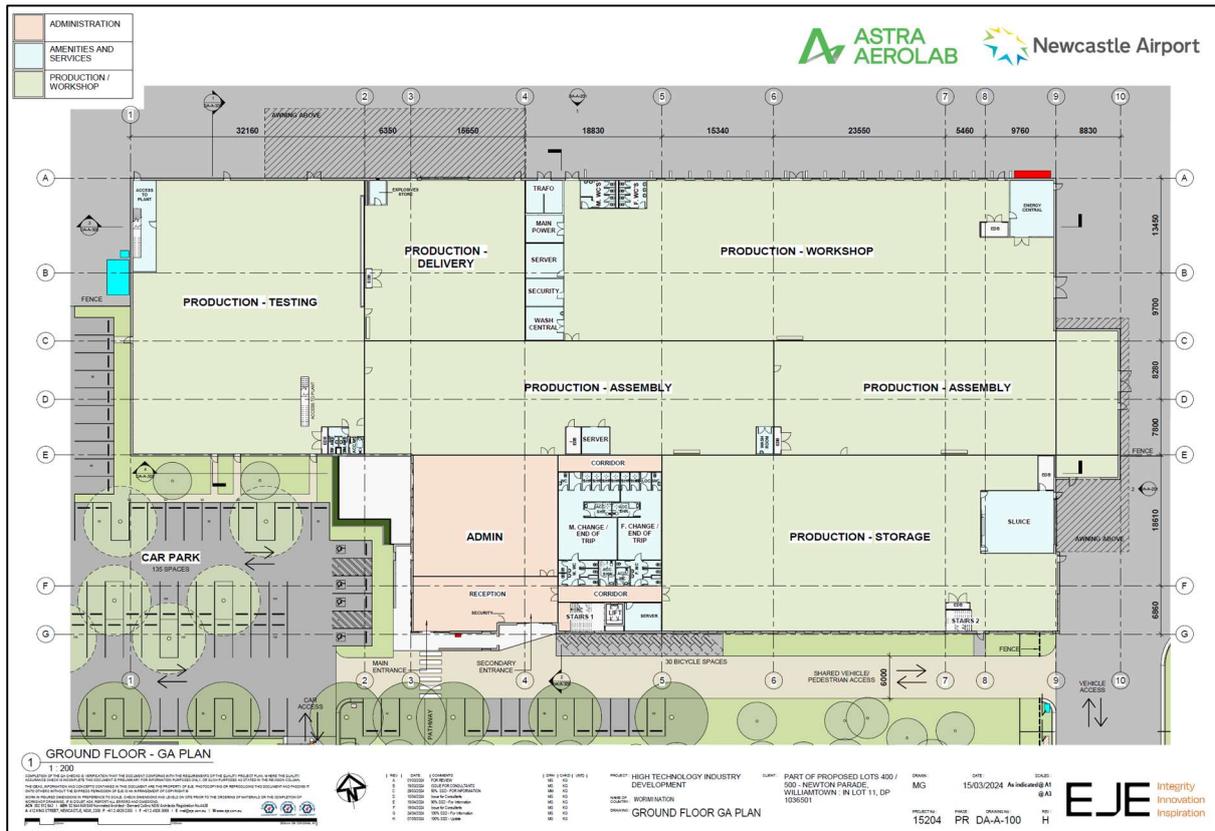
Ground Floor Plan. Source: EJE Architecture (May 2024)
